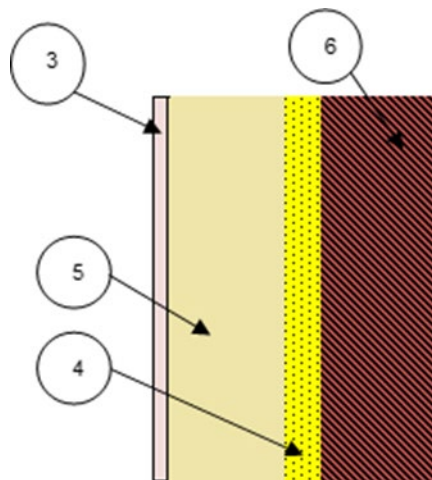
External brick wall (or equivalent) with massive timber wall system – Section view
